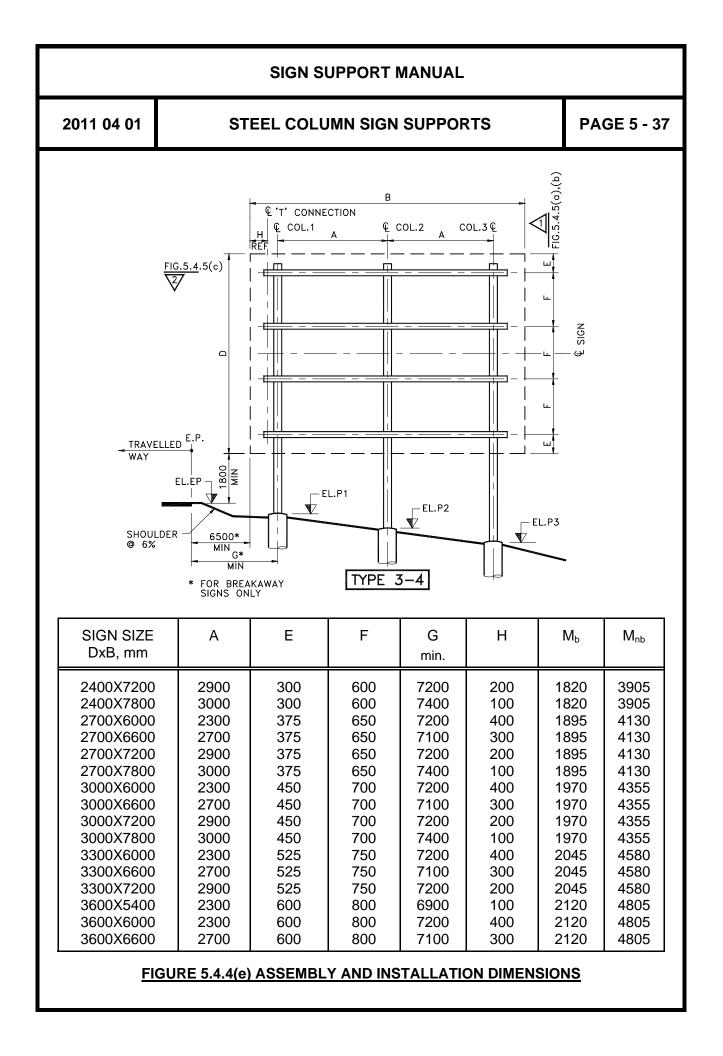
(c) ASSEMBLY AND INSTALLATION DIMENSIONS
